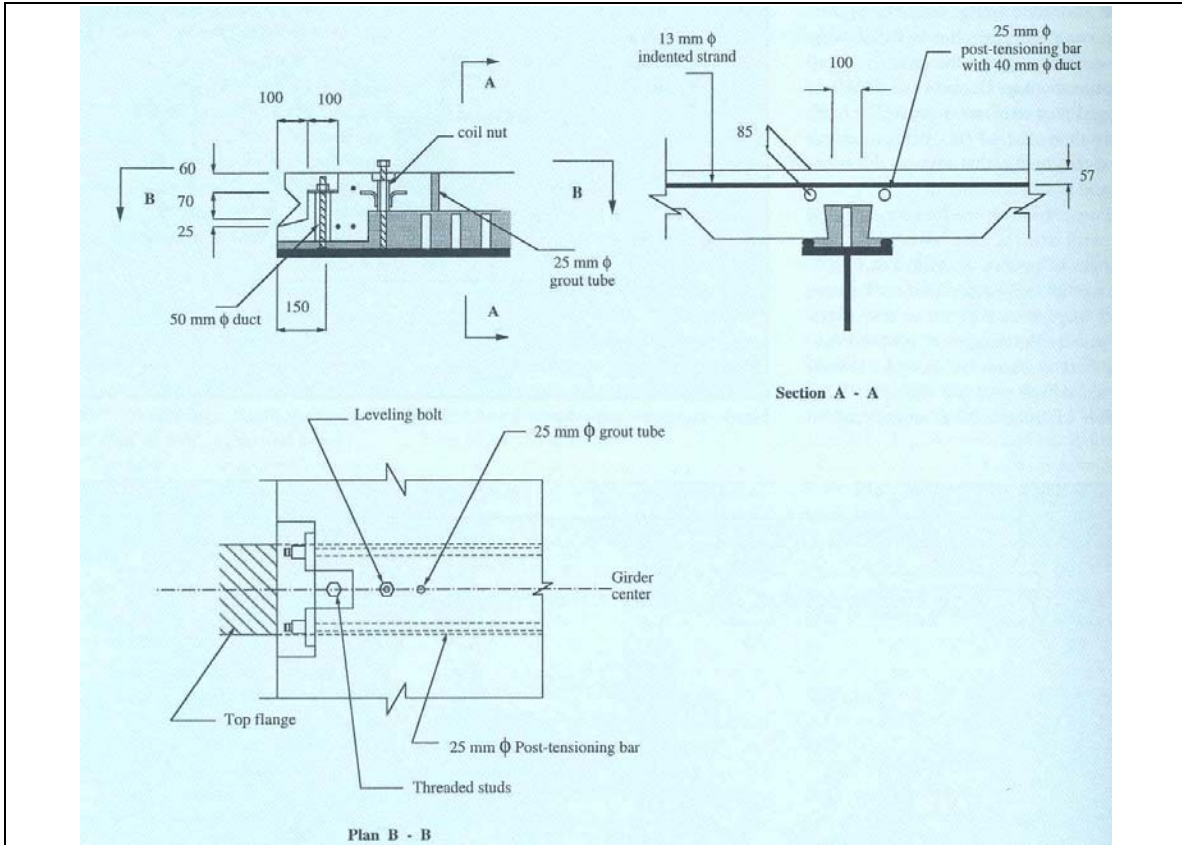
Connection details at a girder location (Yamane et al., 1998)
